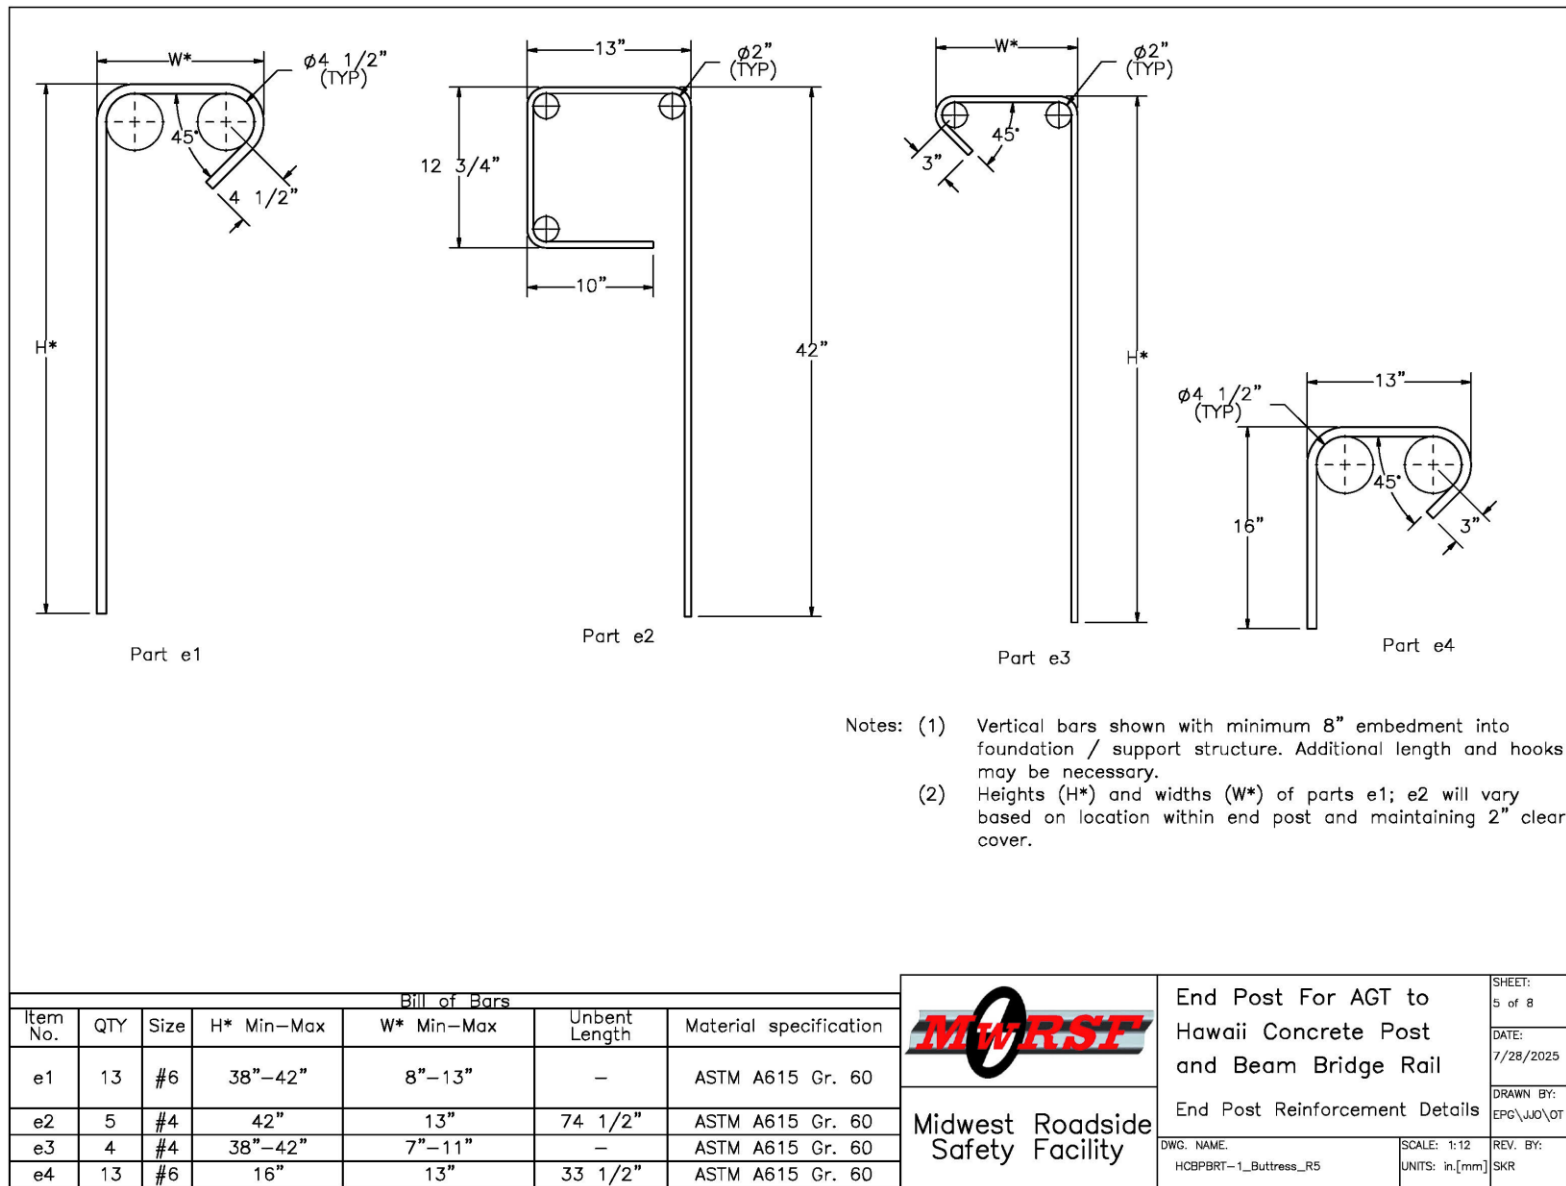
Bridge Rail End Post, Transverse Rebar Details
